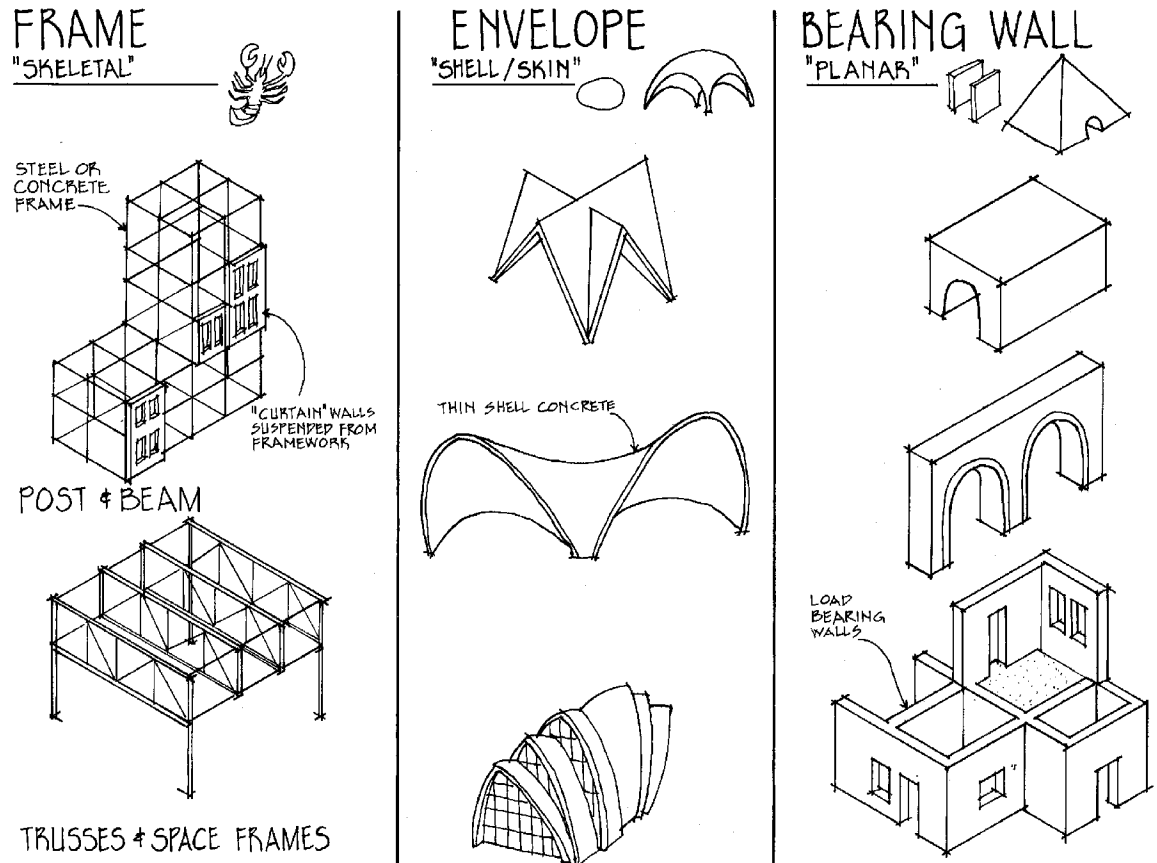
Three basic methods of construction are used to create building forms.
